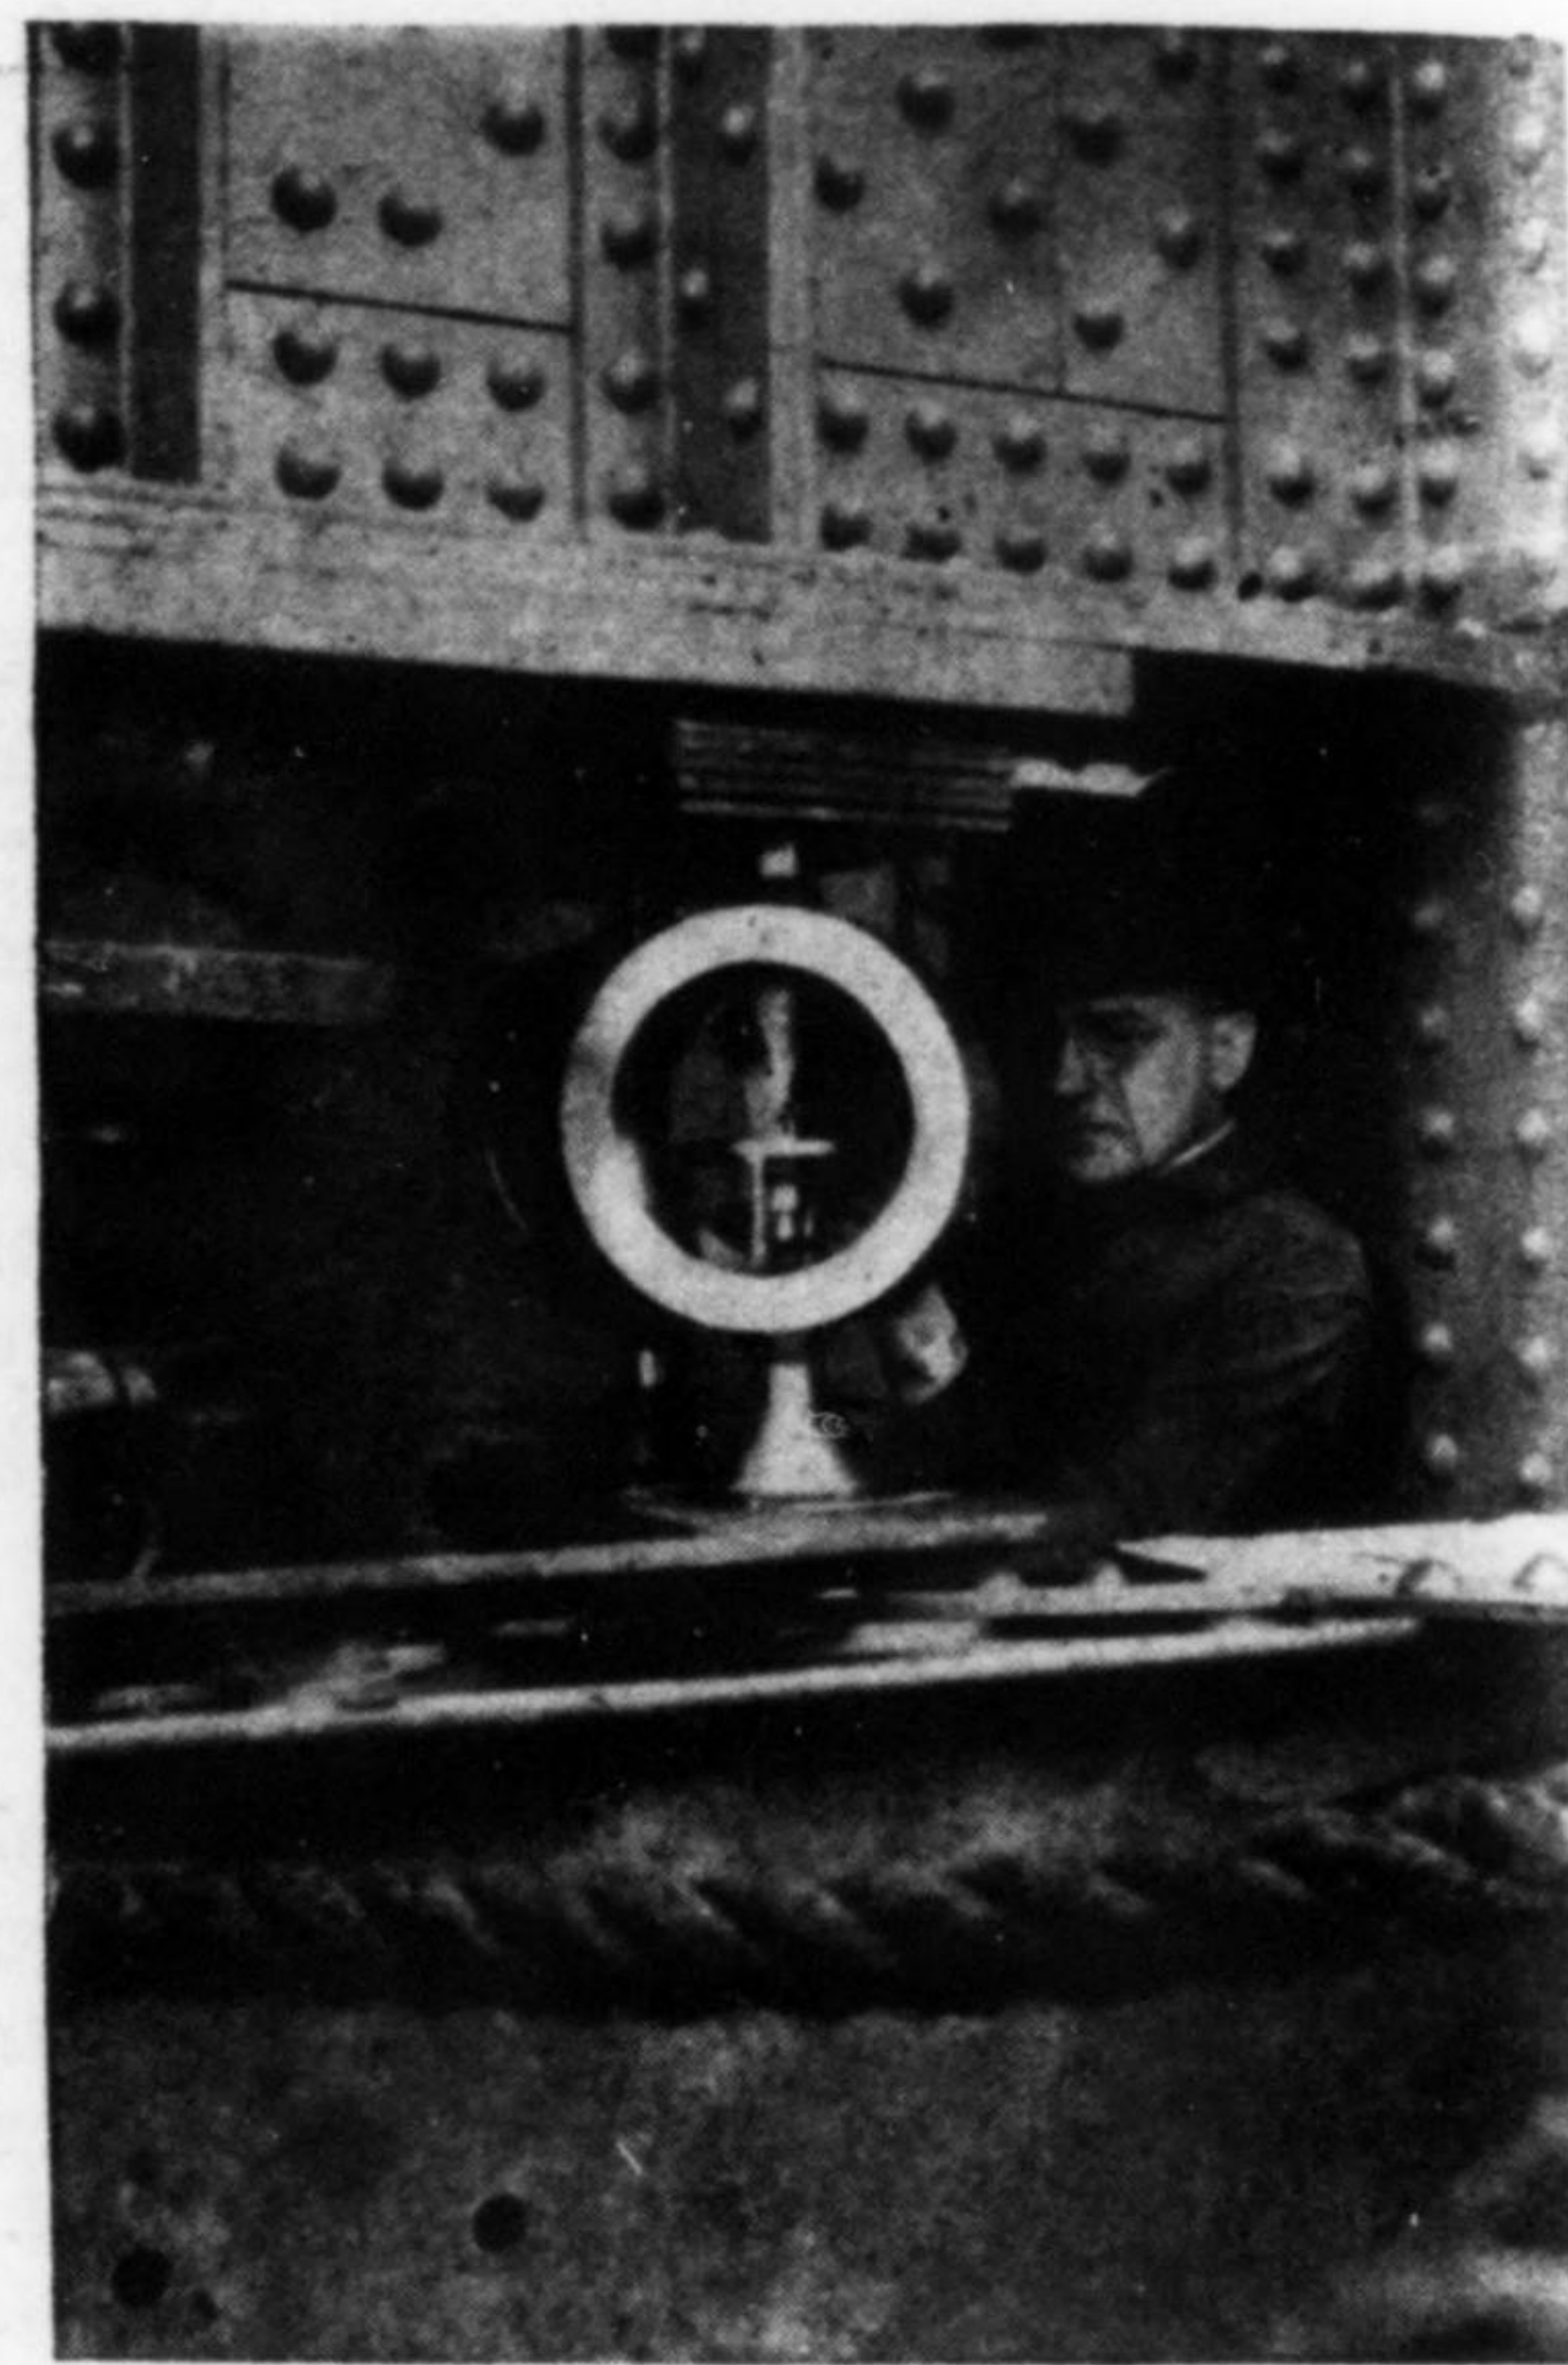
TAKING DEFLECTION readings on two 200,000-lb. proving rings as they carry one corner of the three-span continuous-truss bridge over the Cape Cod Canal at Bourne, Mass.
